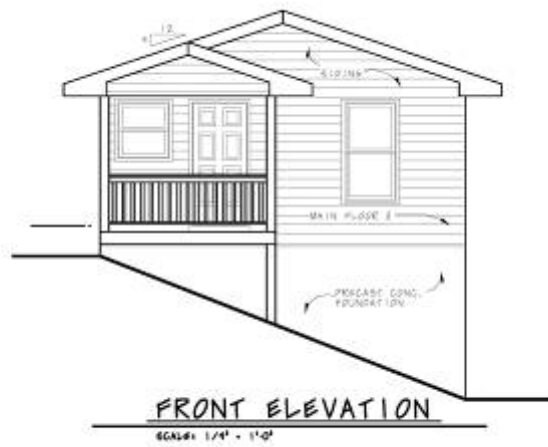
ZEH4 front elevation. The porch roof is also made with SIPS with 2-ft extended overhangs.
